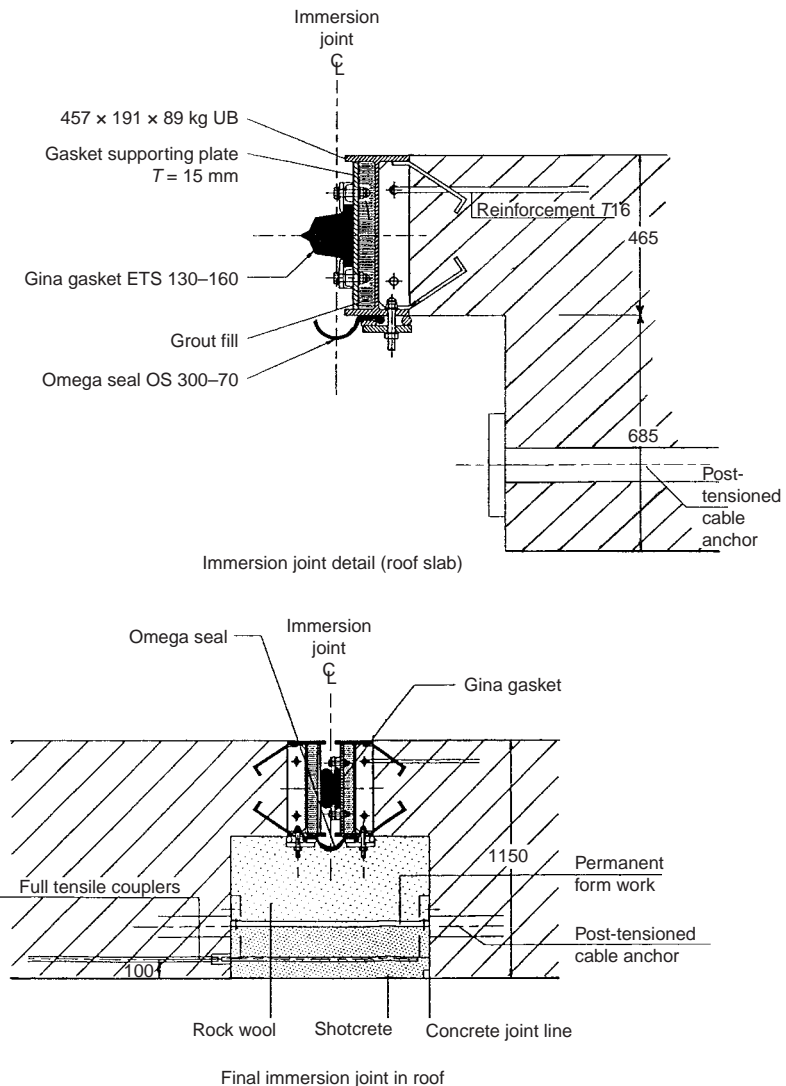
Underwater jointing of immersed tunnels (dimensions in mm)
